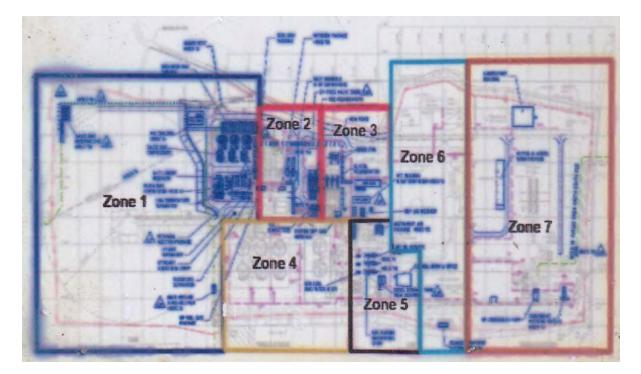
Plant Emergency Layout Plan (SIMOPS Zone - Bibiyana Gas Plant)
